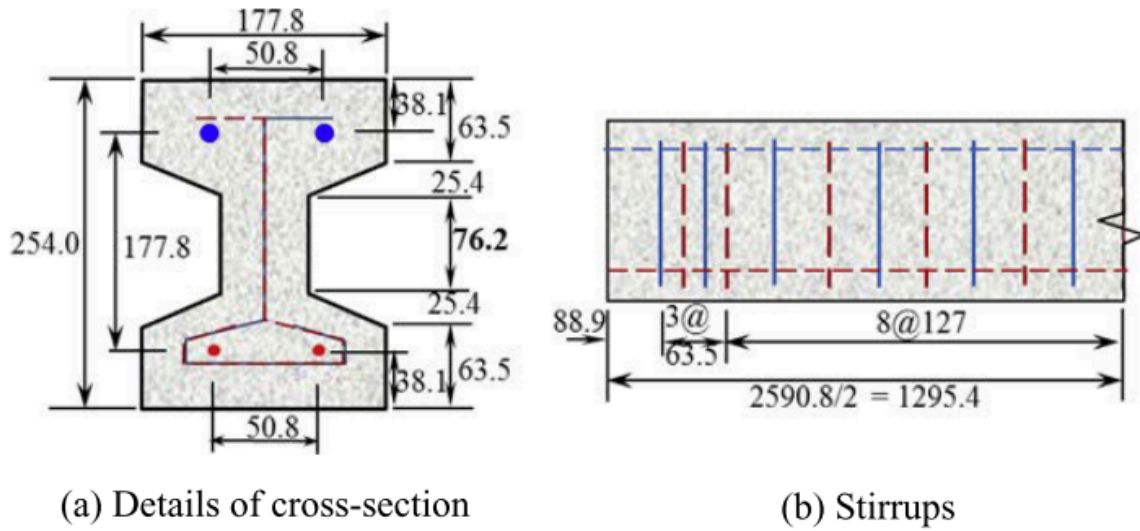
Details of prestressed concrete test beam (mm) (O. Yapar et al. 2015)
